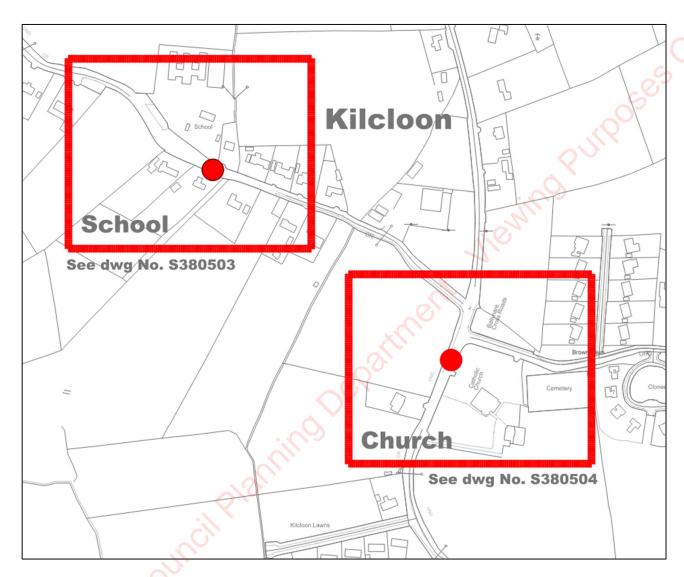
Proposed Site Location of Kilcloon Traffic Calming Scheme
